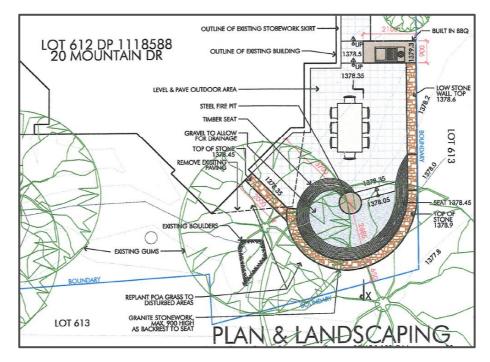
| Proposed outdoor entertainment and landscaping works (Source: Applicant's documentation)
